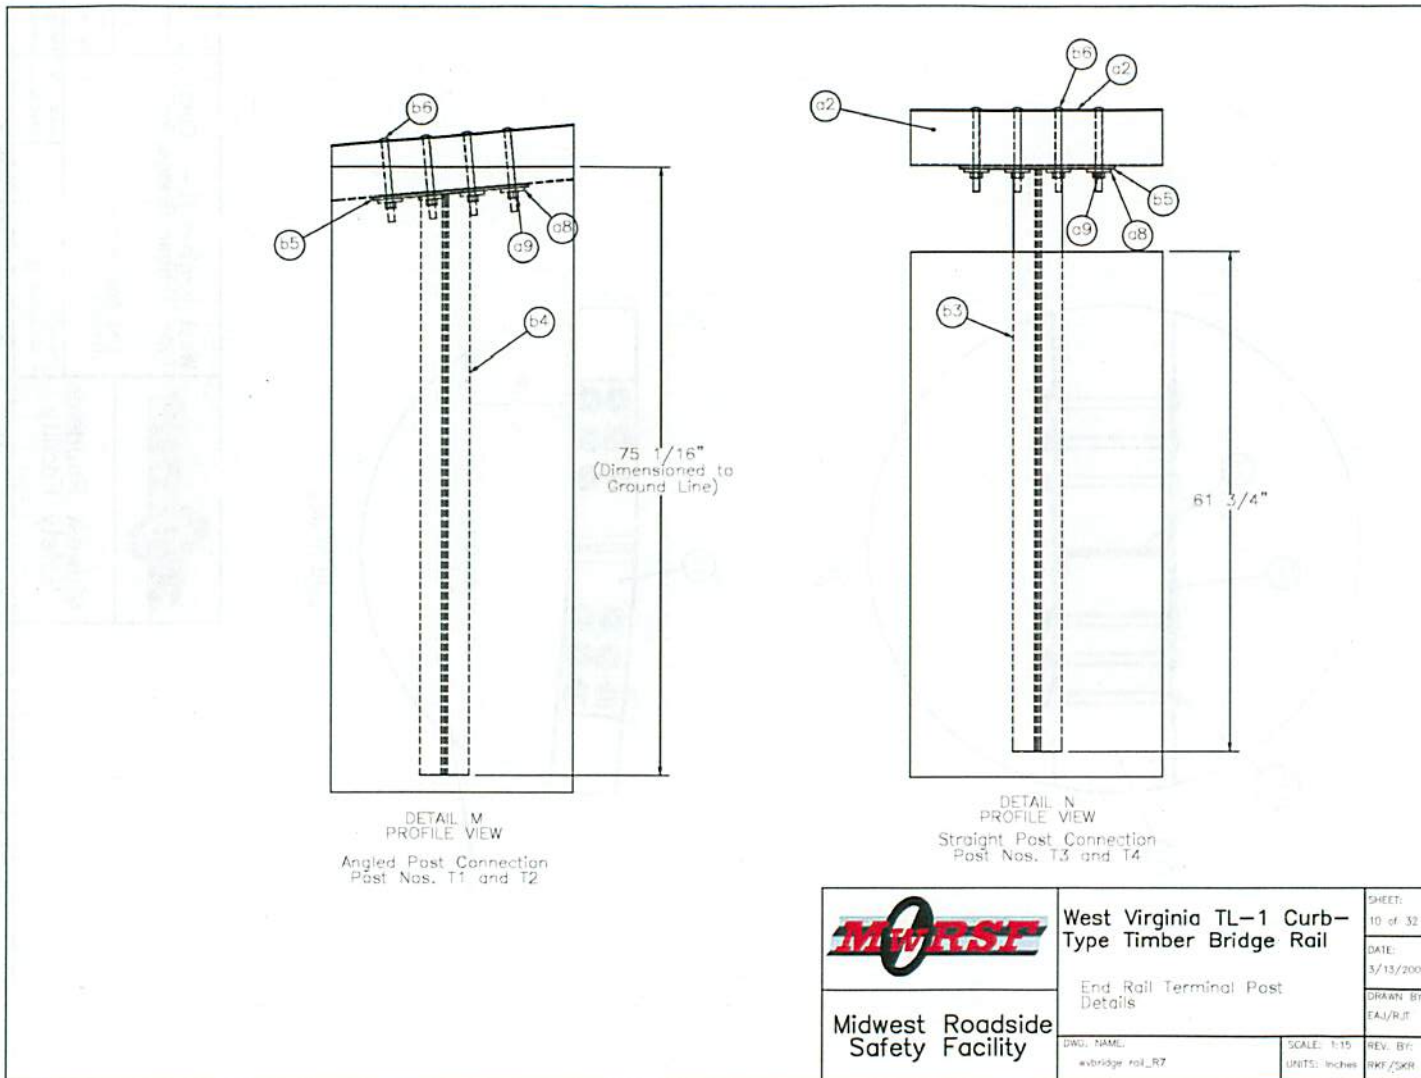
Rail End Section Steel Posts, Test No. WVBR-1
